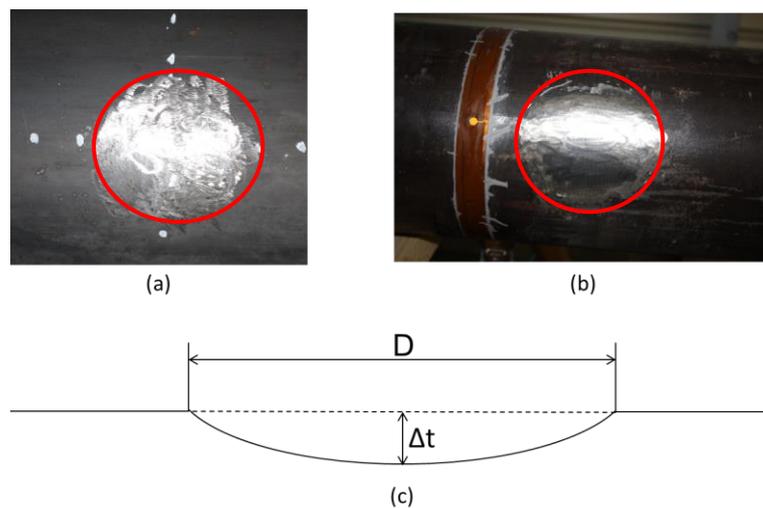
(a) Example of damage on interior of split pipe section (b) Example of damage on exterior of pipe (c) Schematic of damage profile
